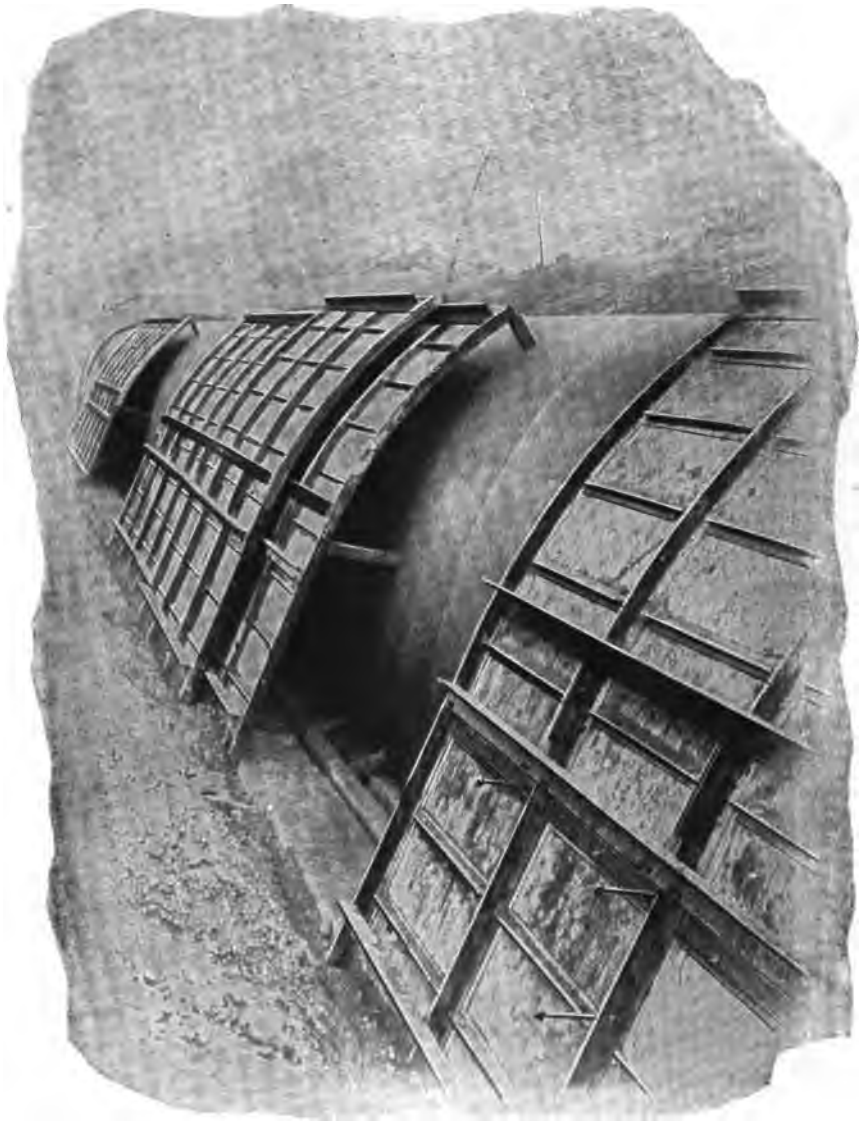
Blaw Outside Forms for Cut-and-cover Aqueduct. They are in 5-foot panels, moved and placed by locomotive crane. Held in place by bolts to inside form.
